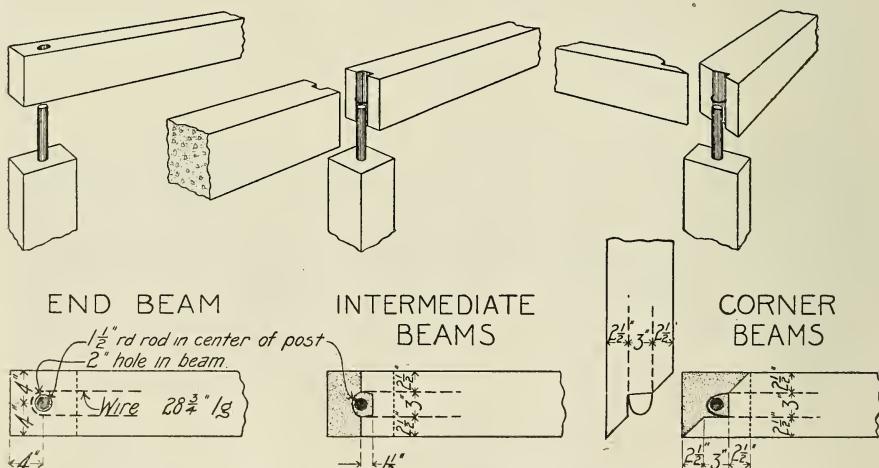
Method of joining end beam, intermediate beams and corner beams to column.
